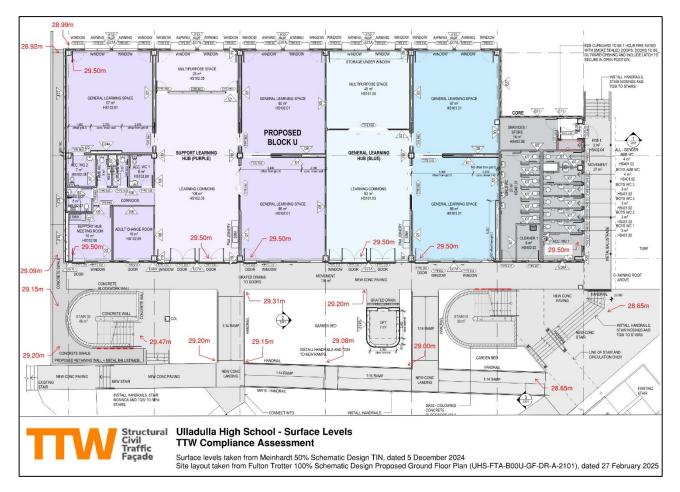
Design ground levels surrounding the proposed building (Source: levels taken from Meinhardt design TIN, dated 5 December 2024; ground floor site plan obtained from Fulton Trotter, UHS-FTA-B00U-GF-DR-A-2101, 27 February 2025)
